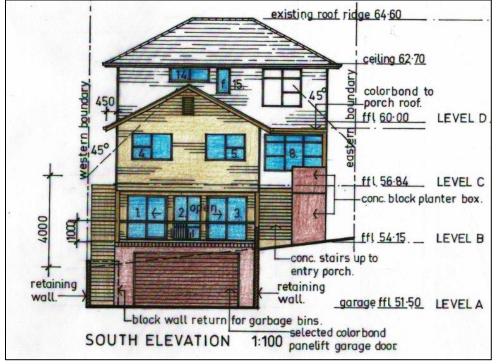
South Elevation Plan (Living Architectural Planning, 2022)
